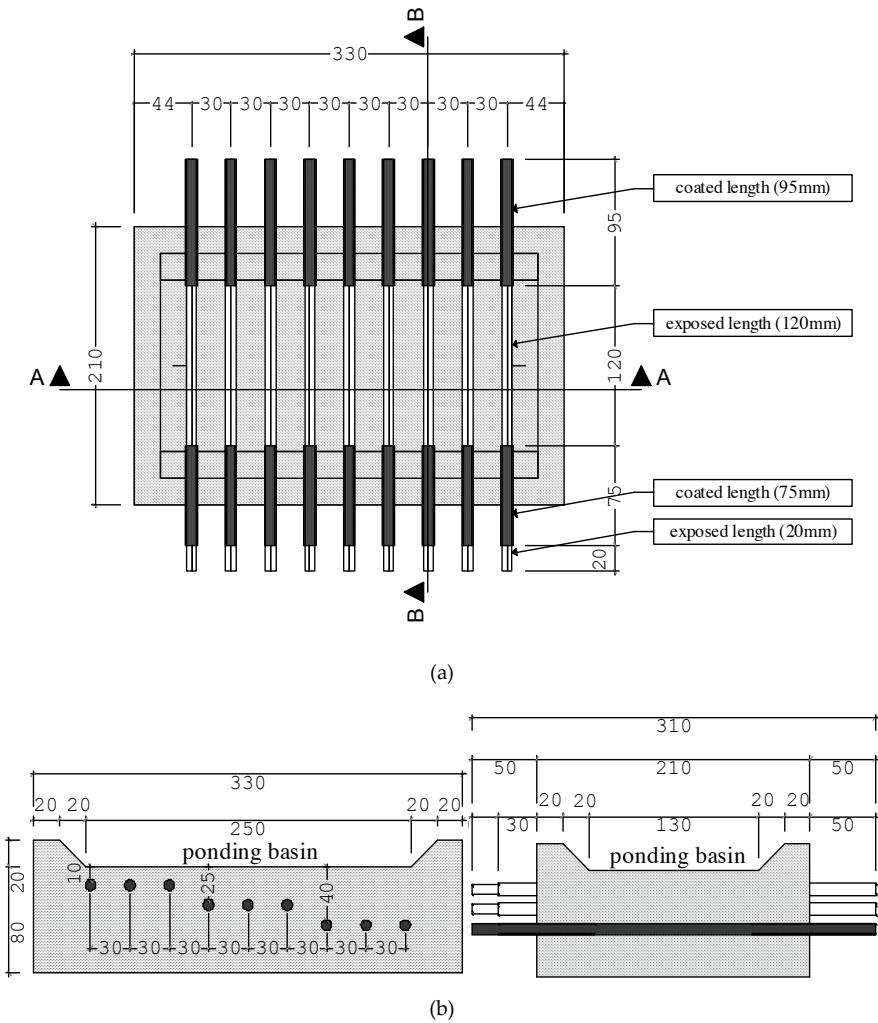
Constructional details of corrosion monitoring specimens, (a) Plan view, (b) Section A/A (c) Section B/B.
